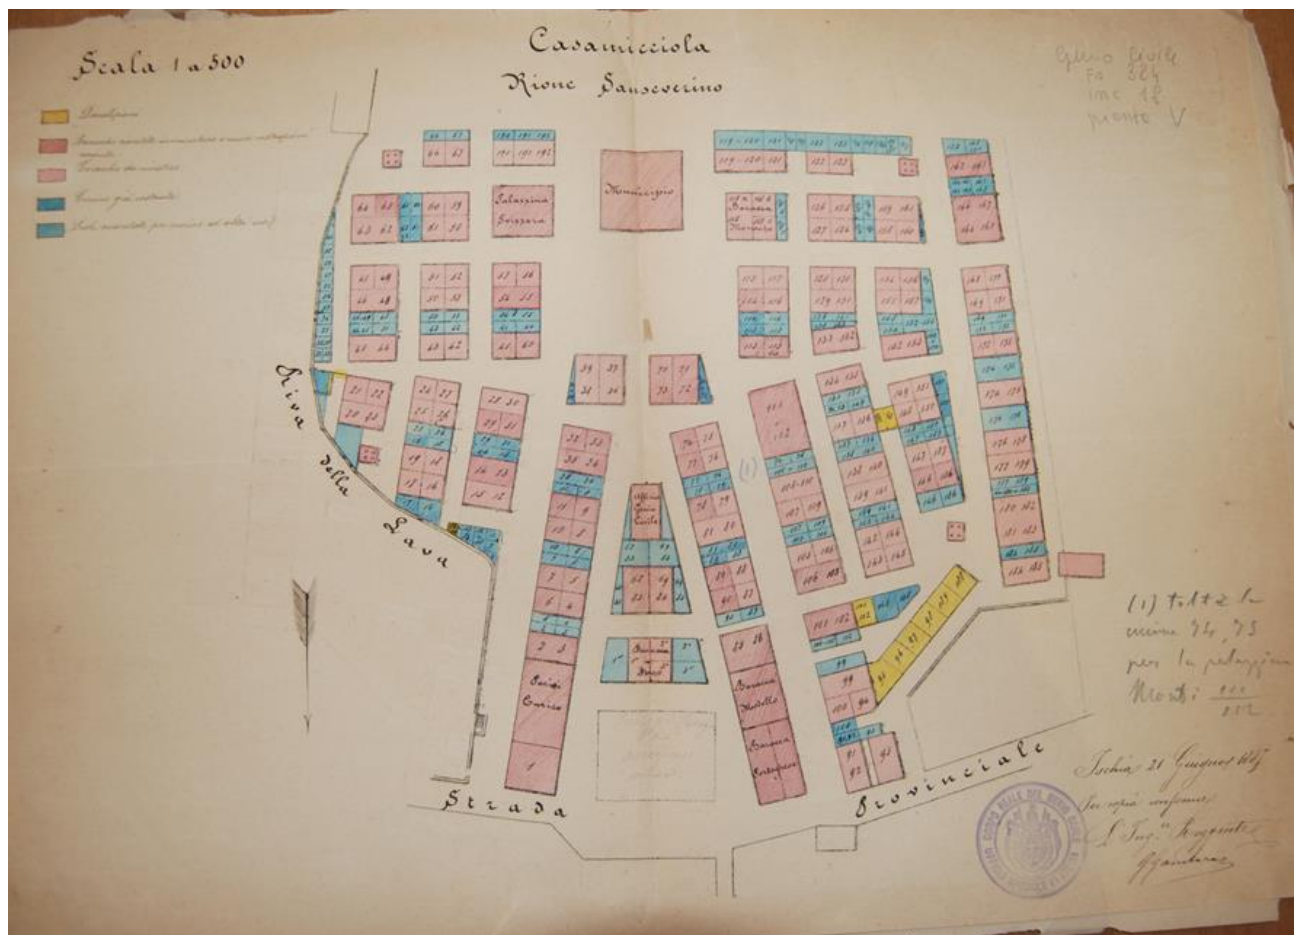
Ischia, Casamicciola, Sanseverino's urban reconstruction plan, cadastral map, 1887. Naples' State Historic Archive (NaSHA). The "improved huts" with the tuff-masonry sidewalls are in pink.
